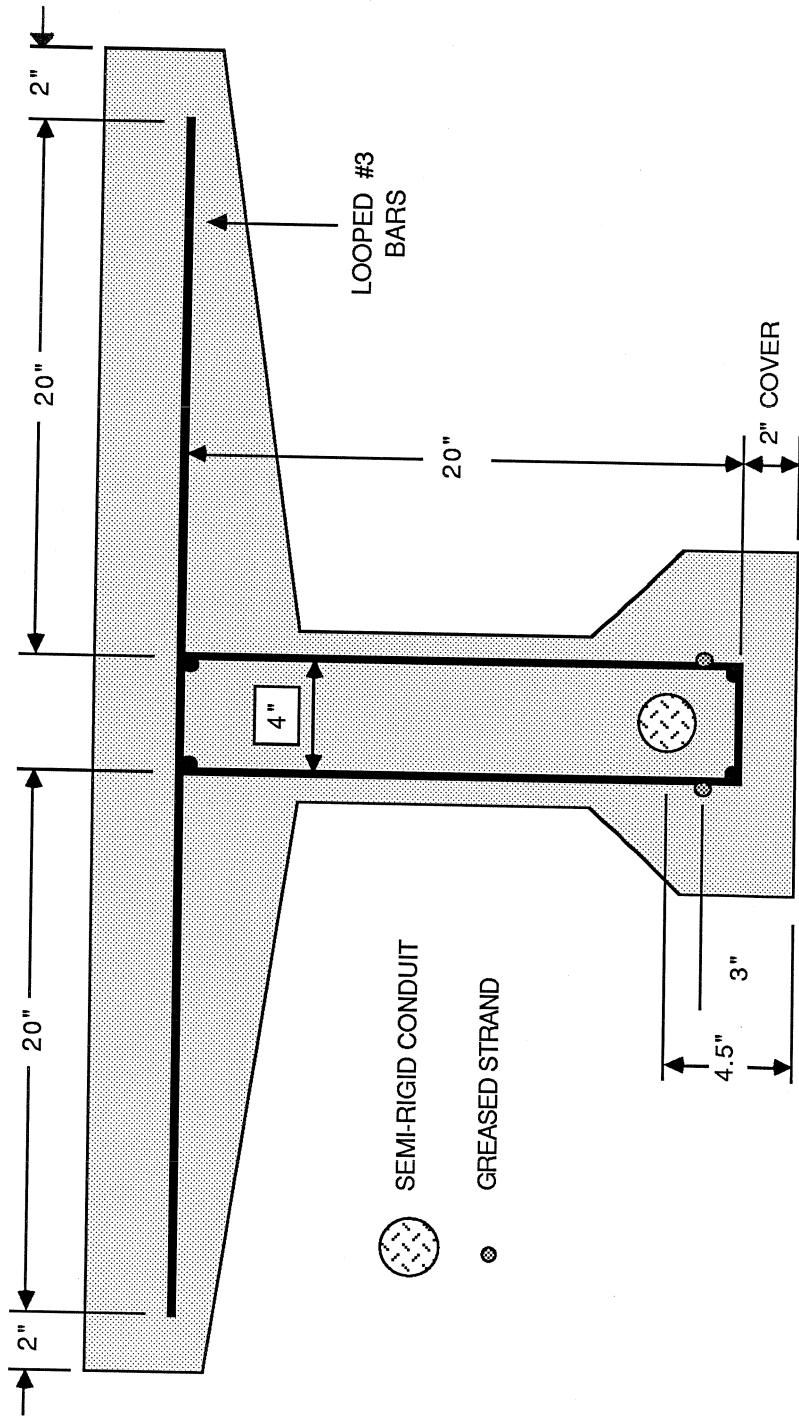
Shear reinforcement cross section: Profile No. 4
